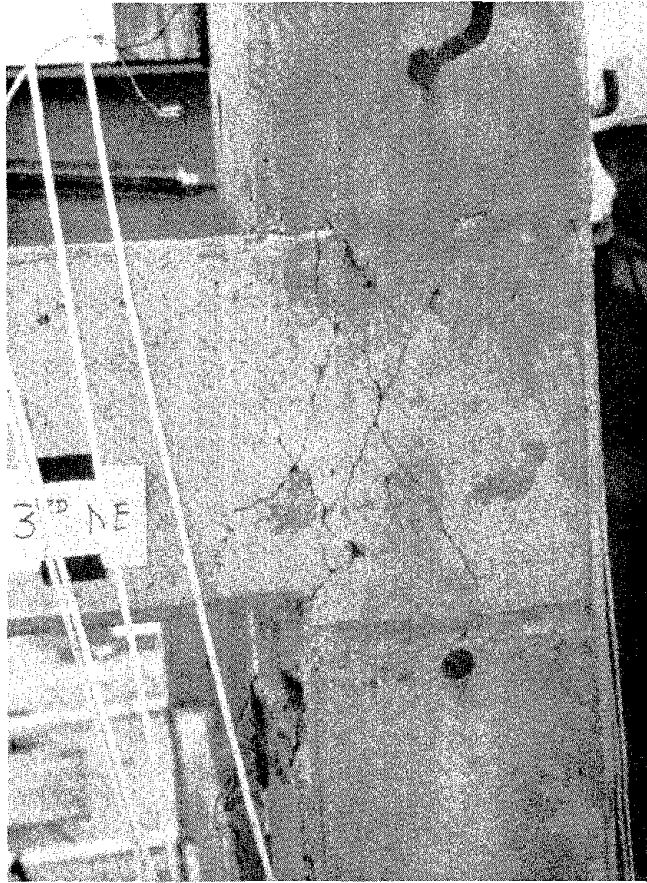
DAMAGE FROM THE 1974 TEST AT THE NORTHEAST CORNER OF THE THIRD FLOOR OF THE ORIGINAL STRUCTURE
